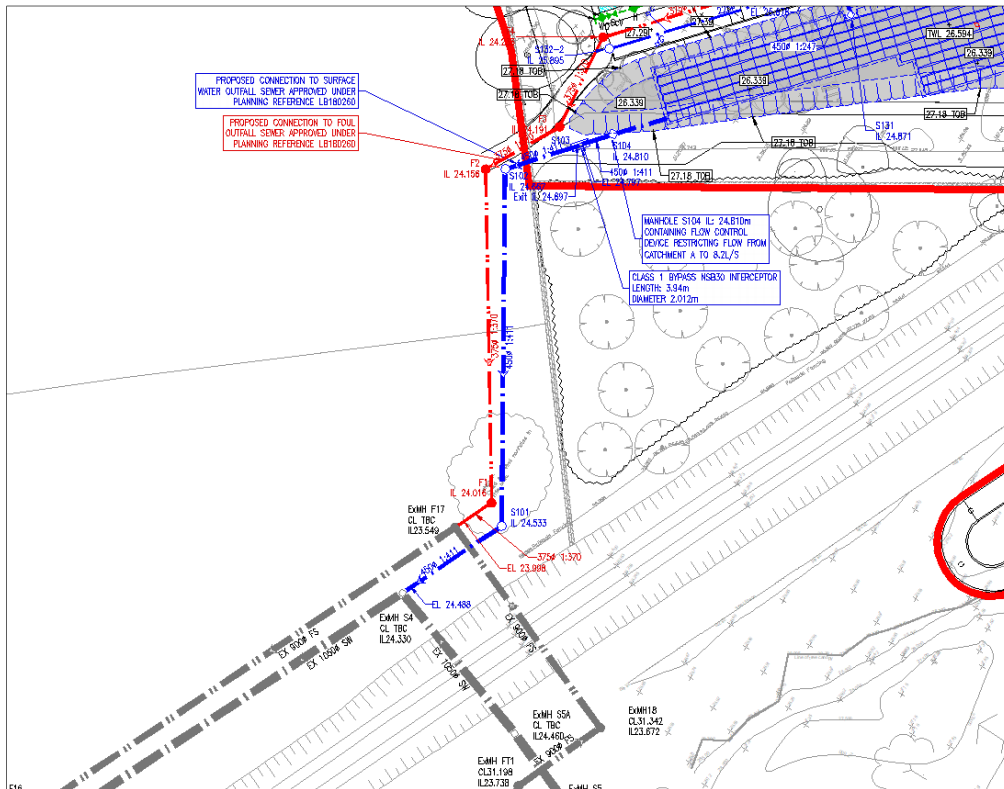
Outfall A; Extract of Site Services Plan indicating the surface water connection point to the existing 1050mm diameter surface water sewer north of railway line
